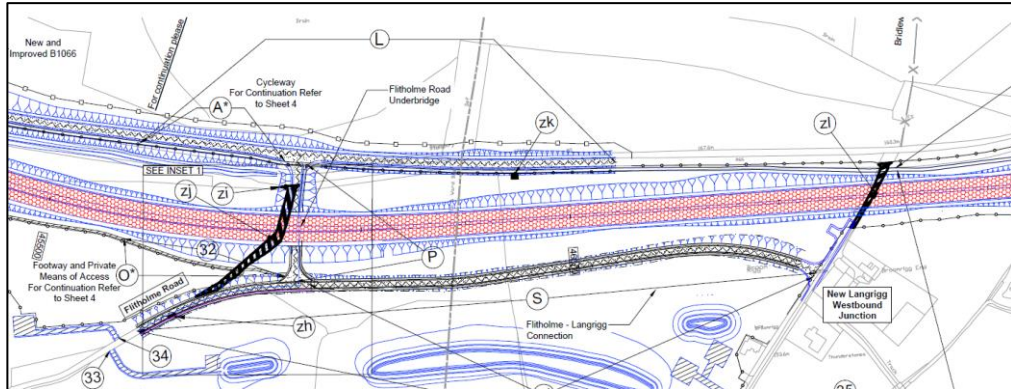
(f) Extract from Rights of Way and Access Plans (After)
